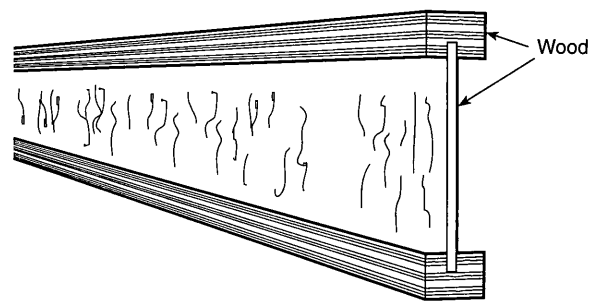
(b) Typical Composite Wood Joist Construction.
